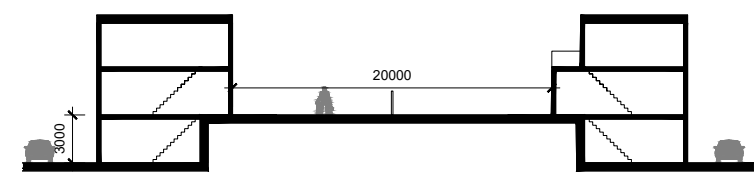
Raising ground levels between buildings to create amenity space accessed from habitable rooms above street level
